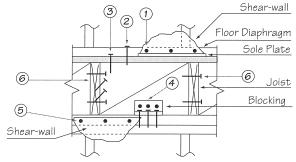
DETAIL H ~ THROUGH-FLOOR SHEAR-WALL CONNECTION WITH I-JOIST FRAMING AT INTERIOR WALL LOCATION.
